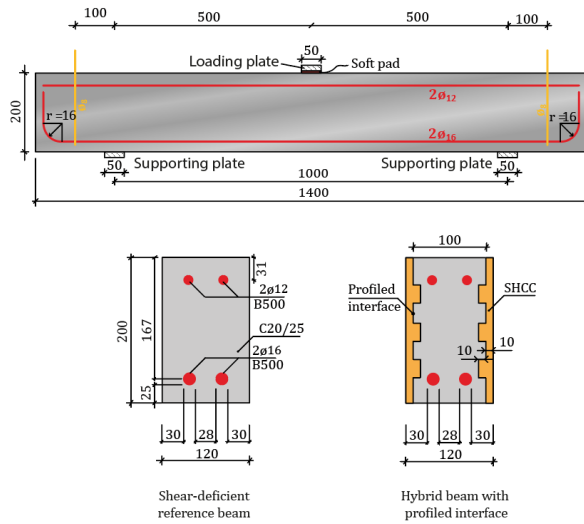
Geometry and reinforcement details of the shear deficient beams.
